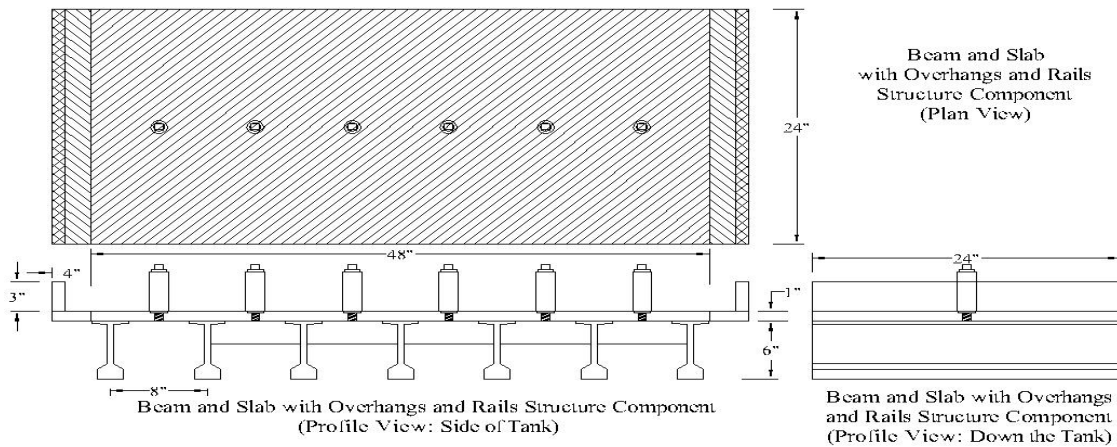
16 Side view of model beam and slab structure with overhangs and solid rails instrumented for slamming forces.
